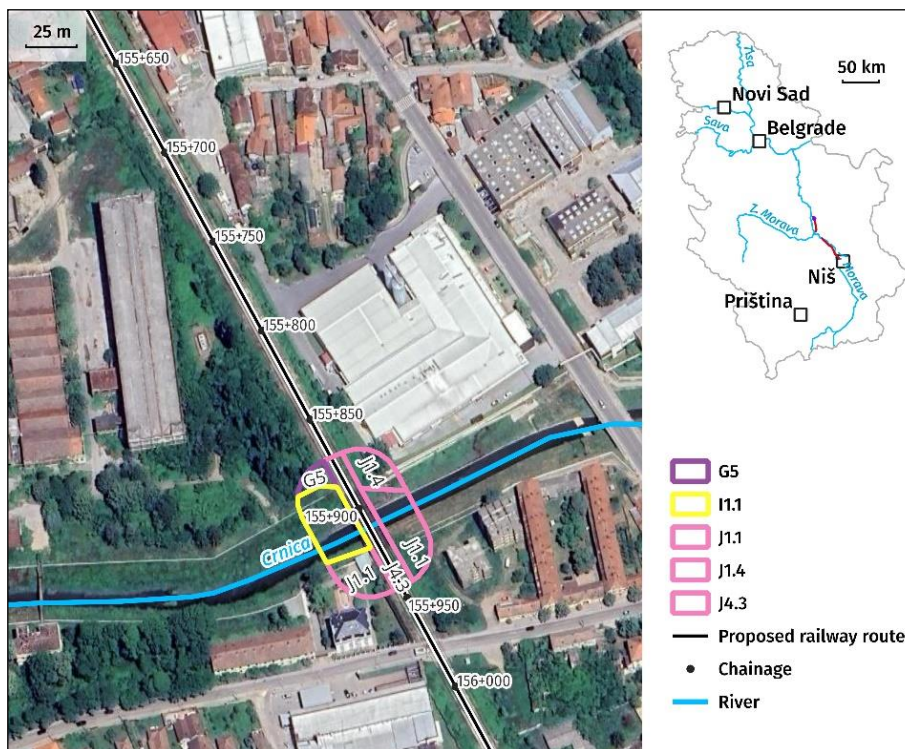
Bridges at km 155+908.80 – Paraćin-Stalać subsection
